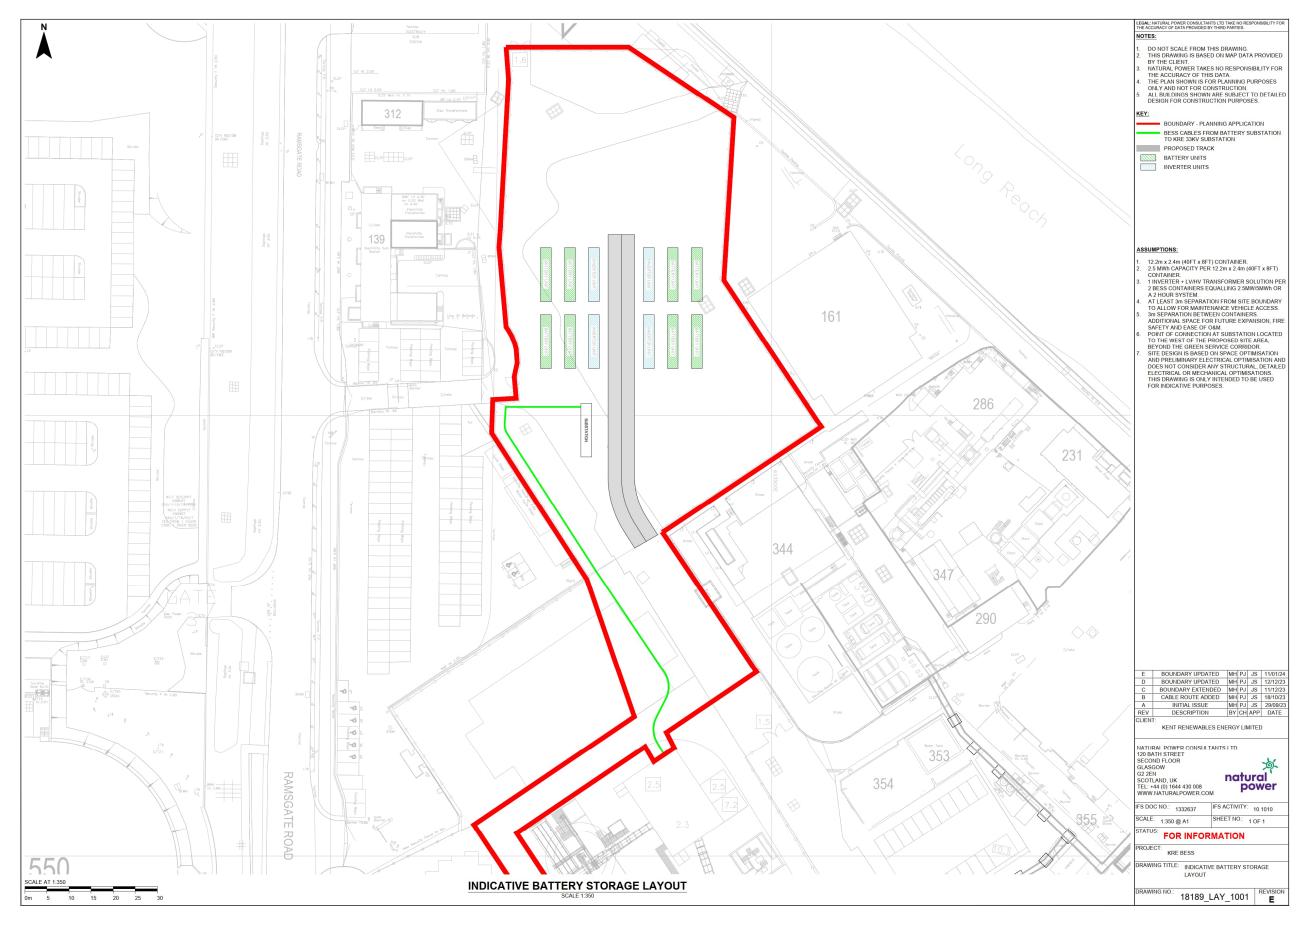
Indicative site layout for the Proposed Discovery Park BESS facility
